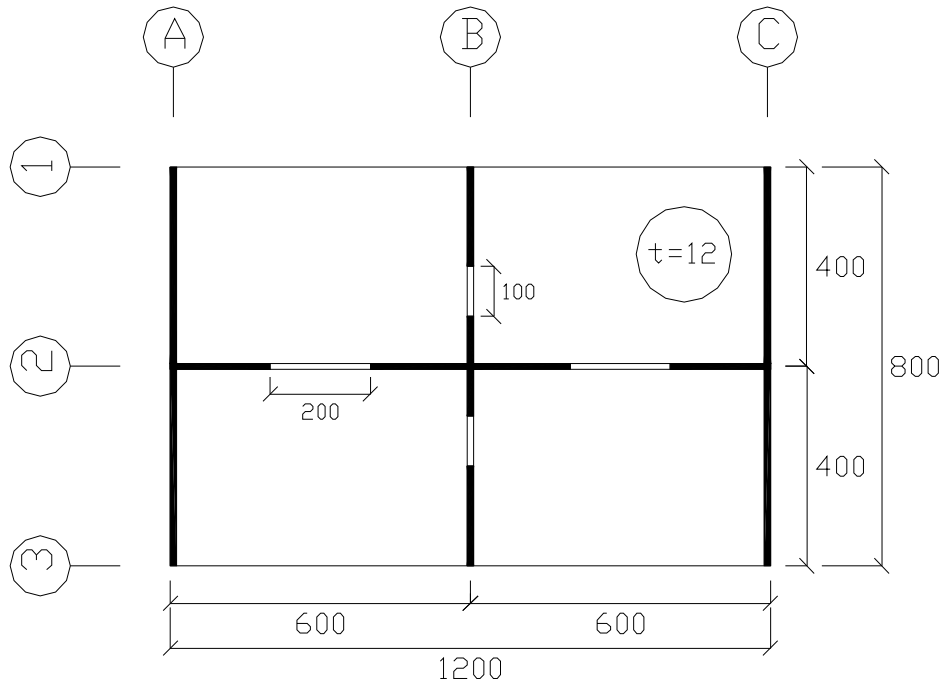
Typical plan view – Plan No. 4 (units in cm)
